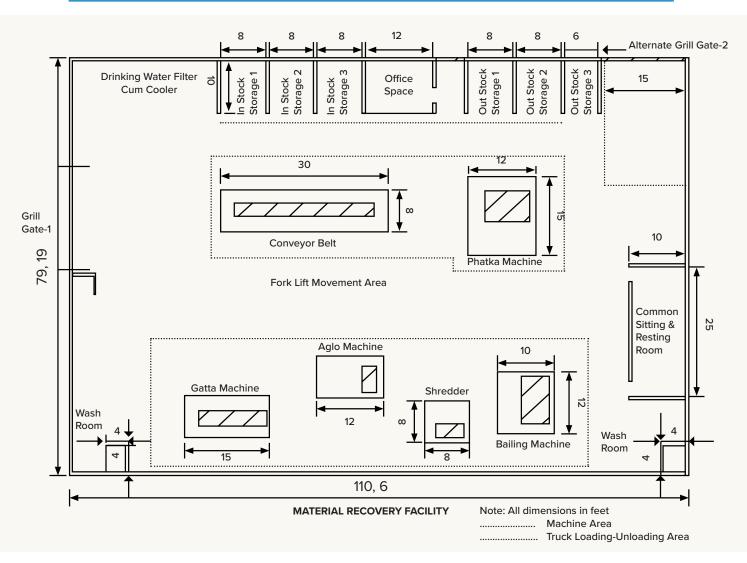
Conceptual layout plan of MRF. Source: UNDP
